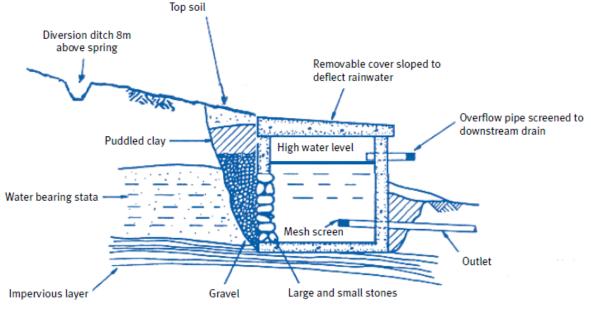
Cross-sectional view of a spring box (Source, WaterAid, 2009)
